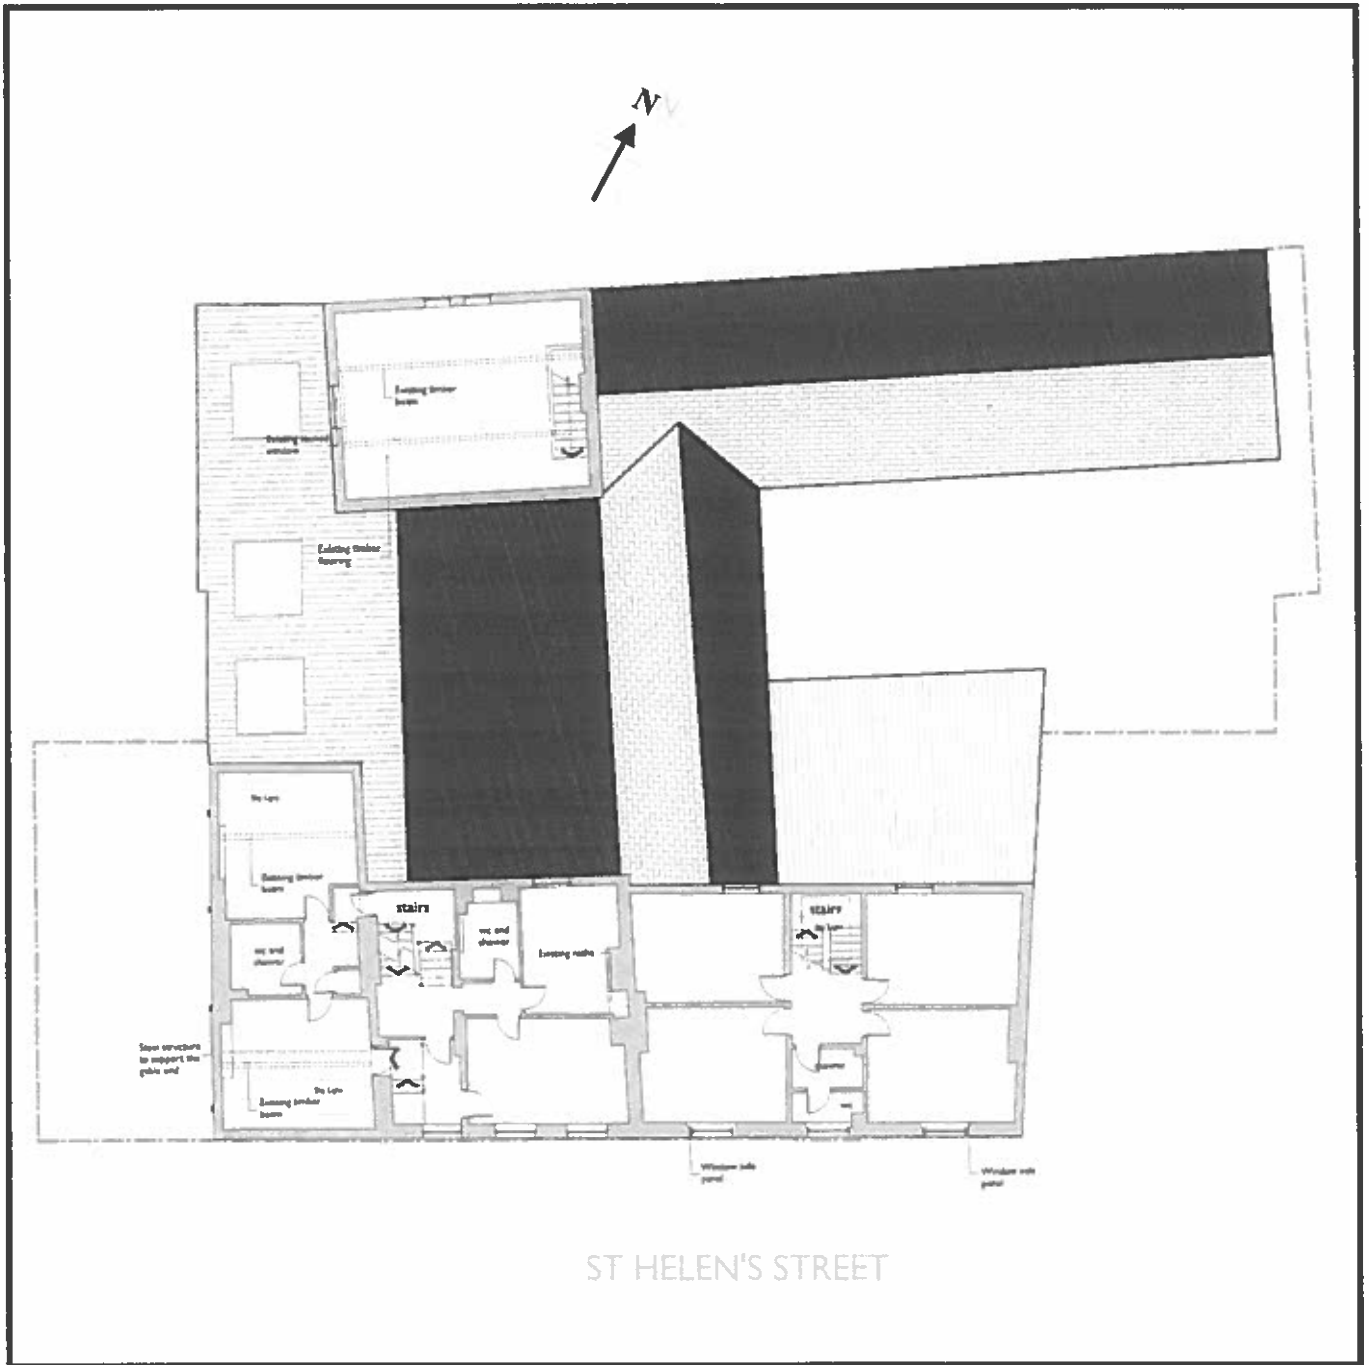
Present second floor plan of 10-14 St Helen's Street, Derby . Scale 1:200.
